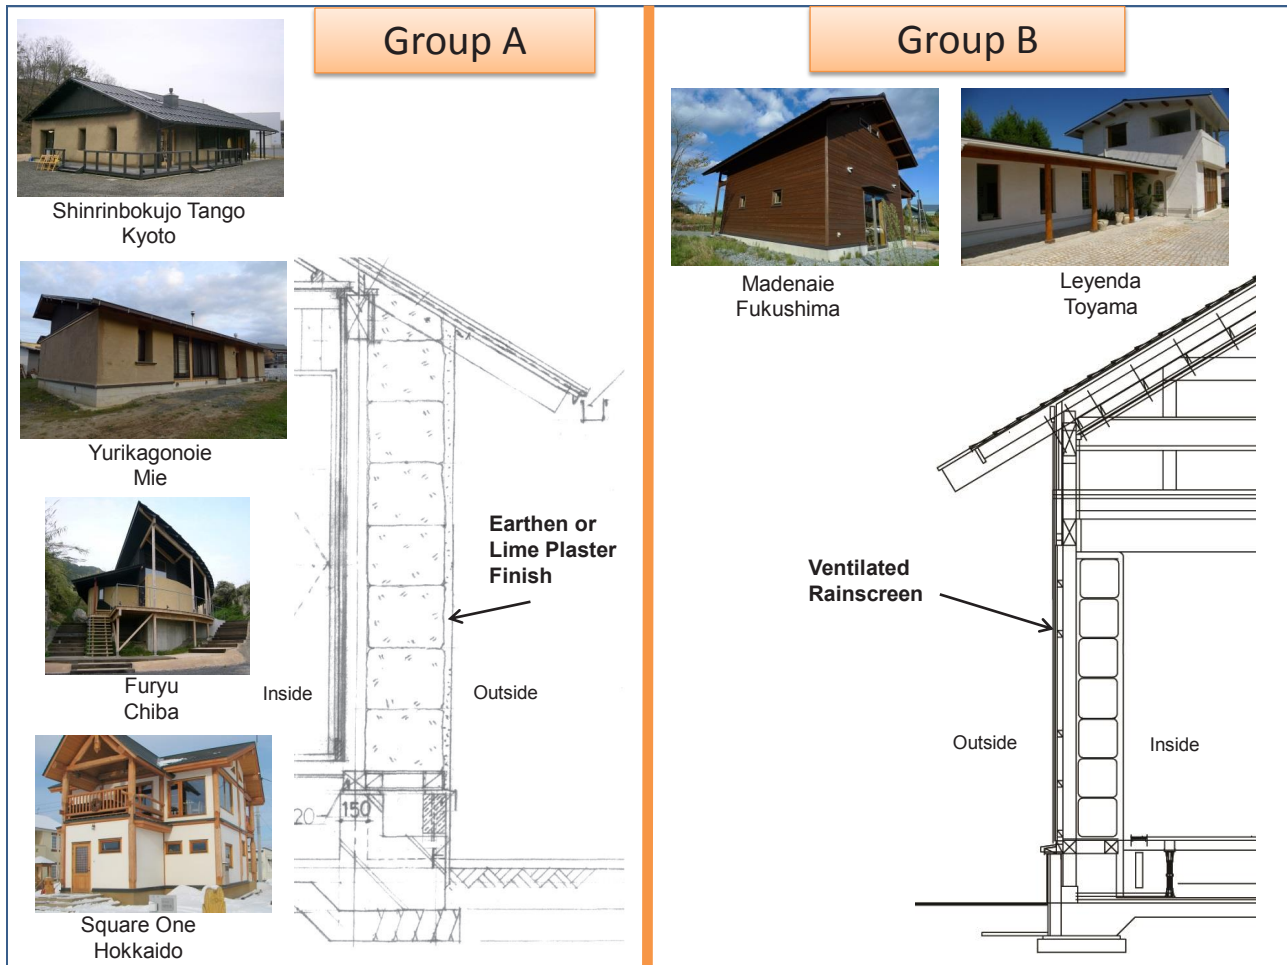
Six Straw Bale Buildings Divided into Two Groups
